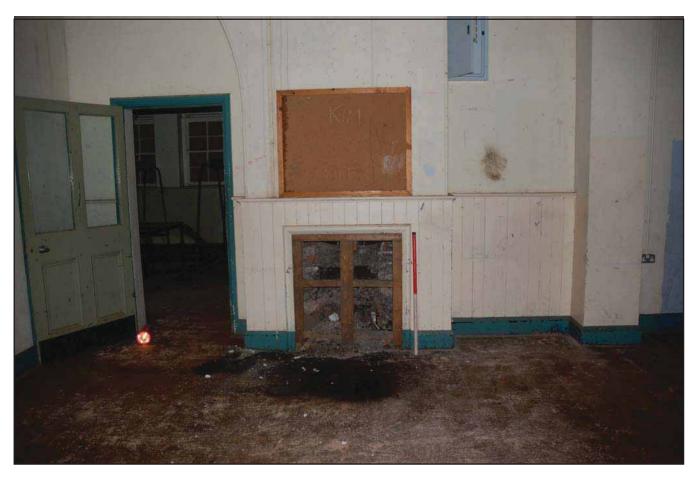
School Bank Road south building room G04 east elevation detail of fireplace
